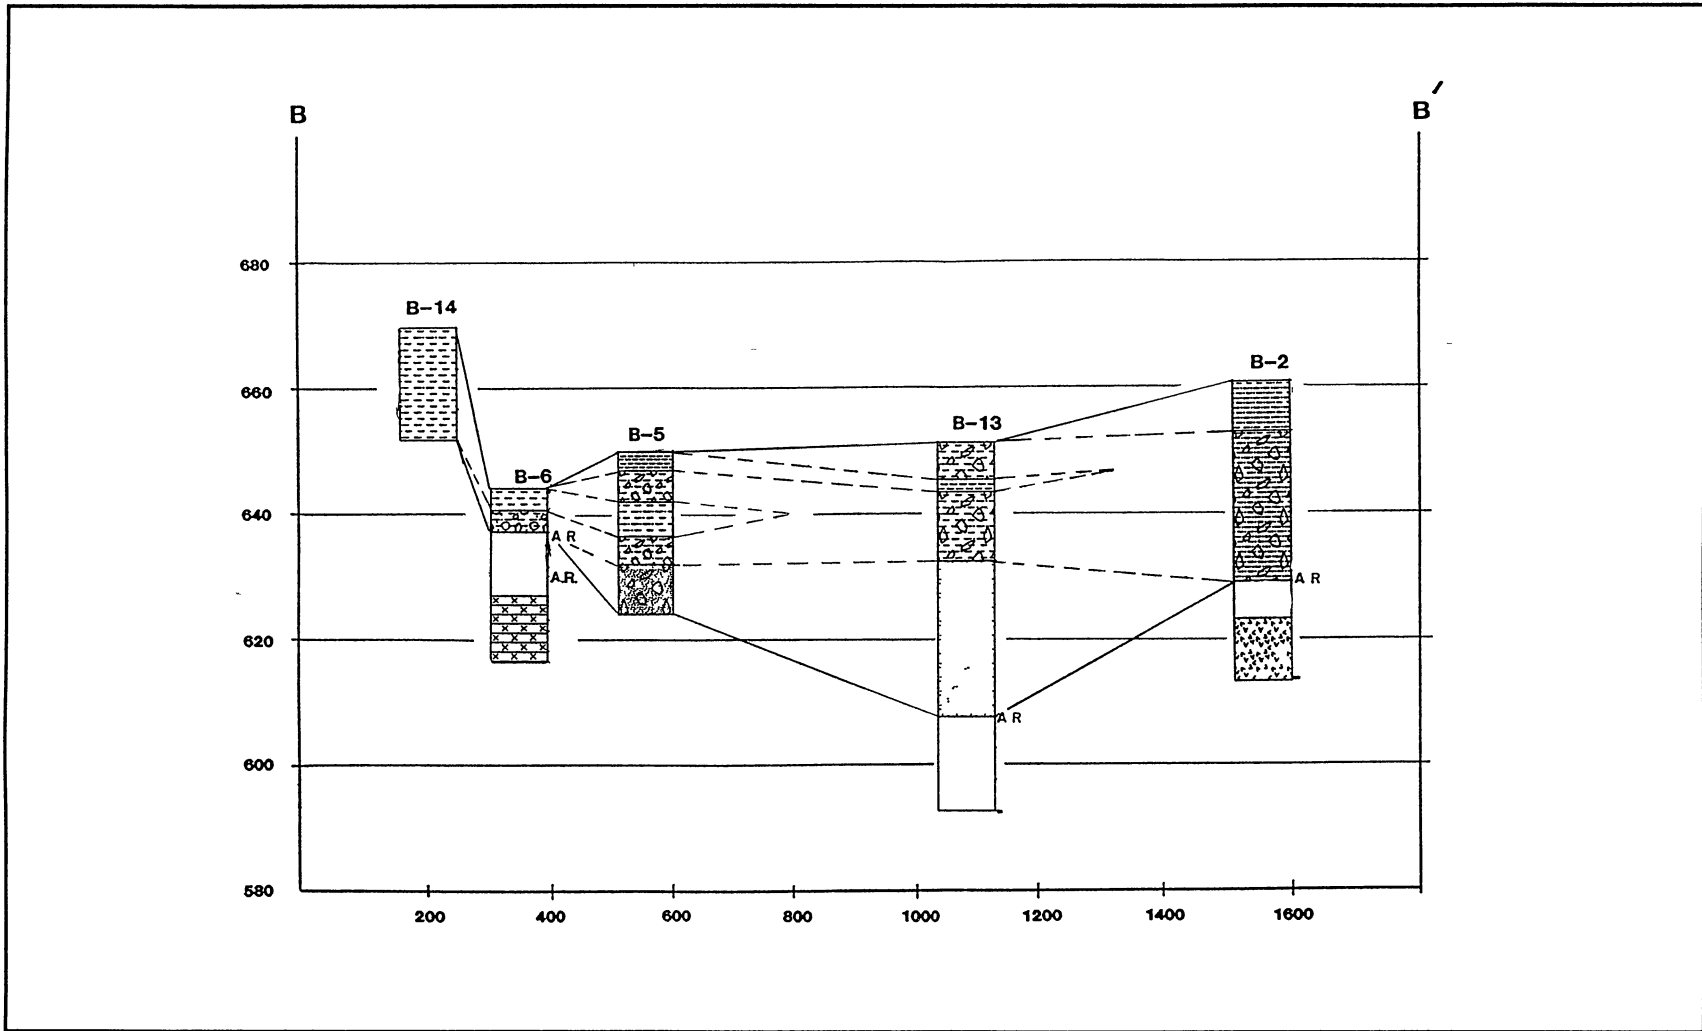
Cross section B-B'. (Graphic scale in feet. Vertical scale is elevation; horizontal scale is relative distance between boring locations.)
